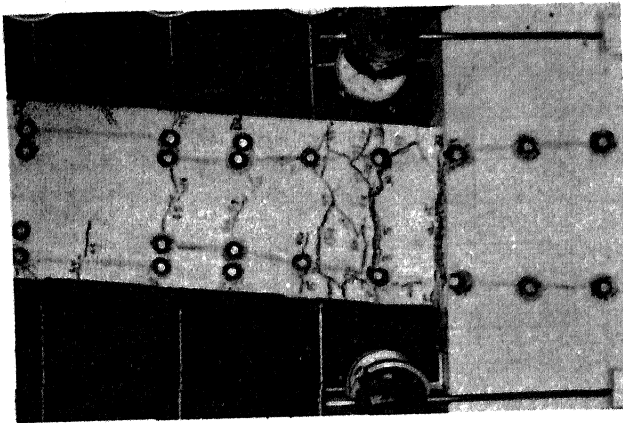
The Plastic Hinge Zones of Beam-Wall Junction Specimens.
